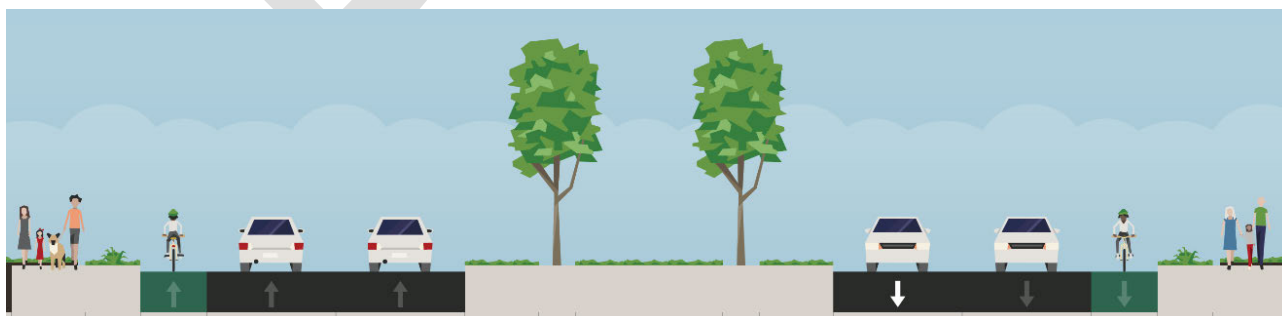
Typical existing cross section on Te Irirangi Drive with cycle facilities
